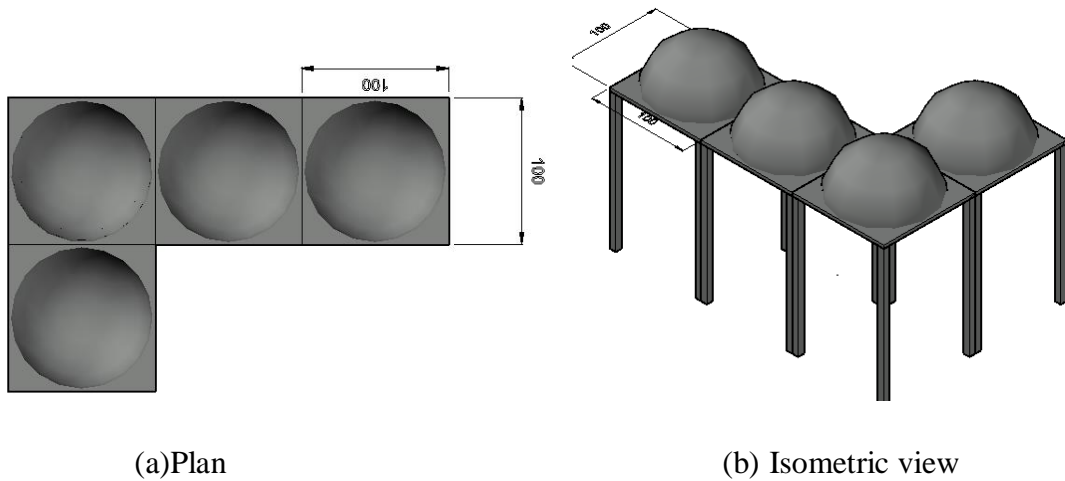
5 Plan and Isometric view of arrangement of domical roof buildings in T shape at 150 mm spacing
